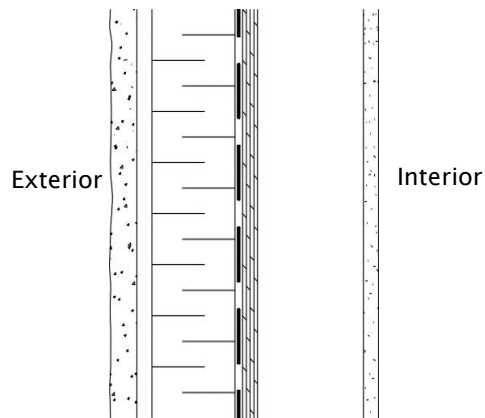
Exterior Insulated Rainscreen Stucco Wall
